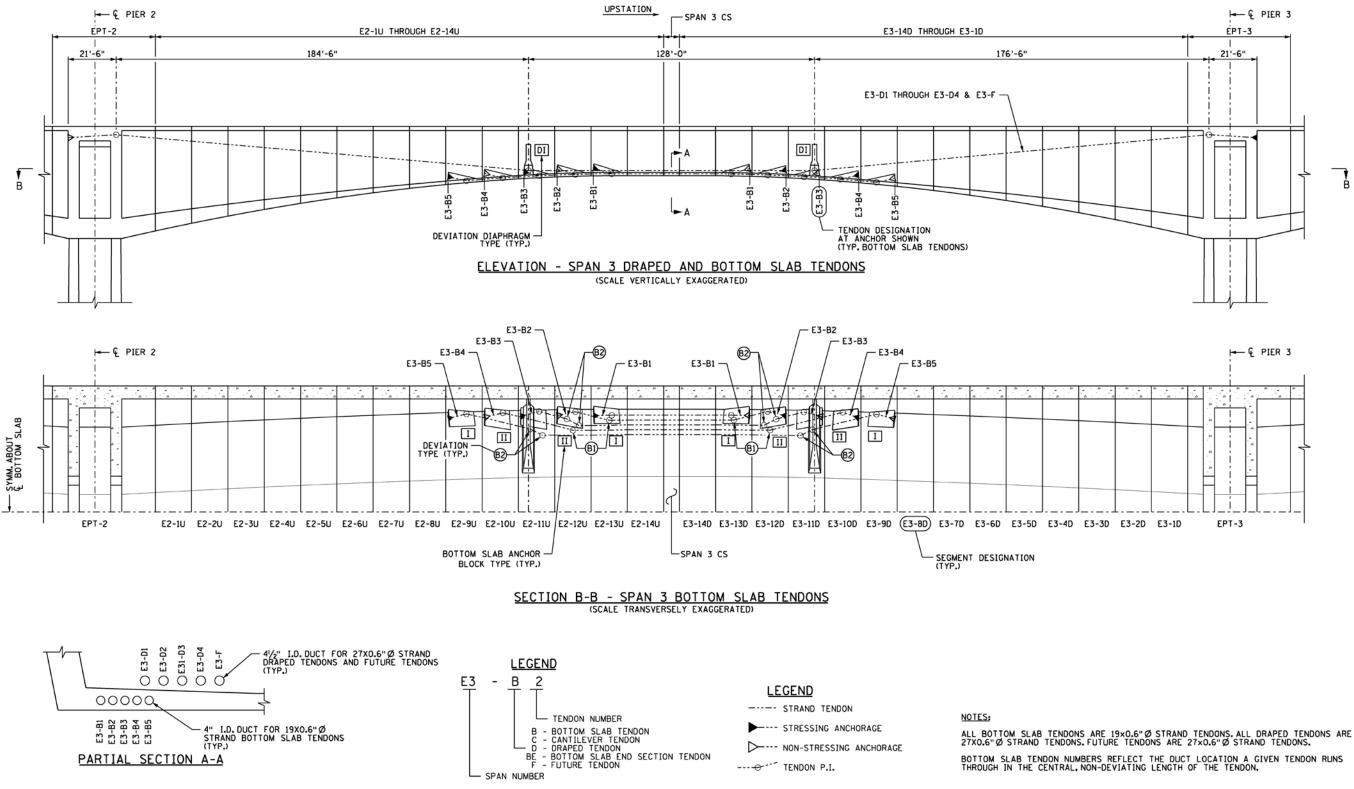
Eastbound Span 3 Draped and Bottom Slab Post-Tensioning Layout
